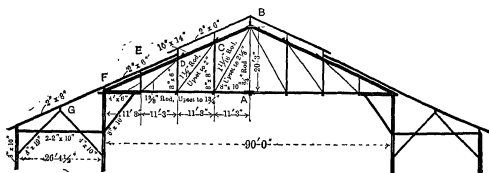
A comparatively large roof-truss of the Pratt type of bracing, showing details of many joints. A large number of special castings appear in this truss.
